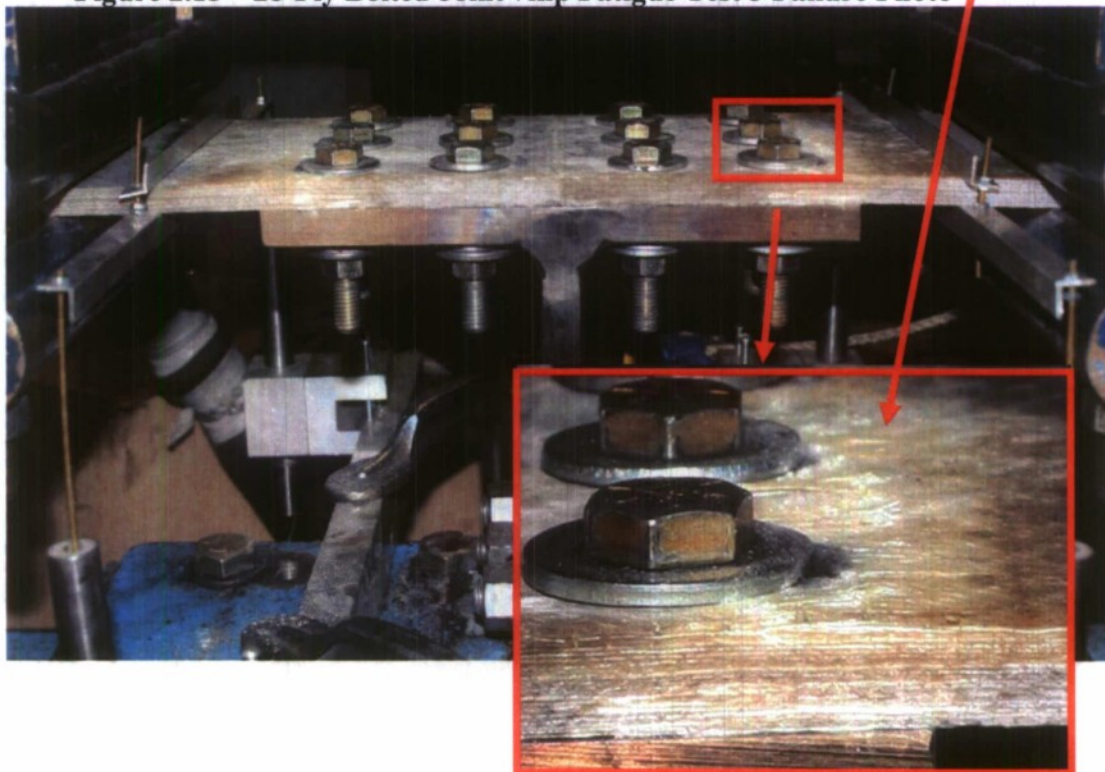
28-Ply Bolted Joint 7kip Fatigue Test 2 Failure Photo
